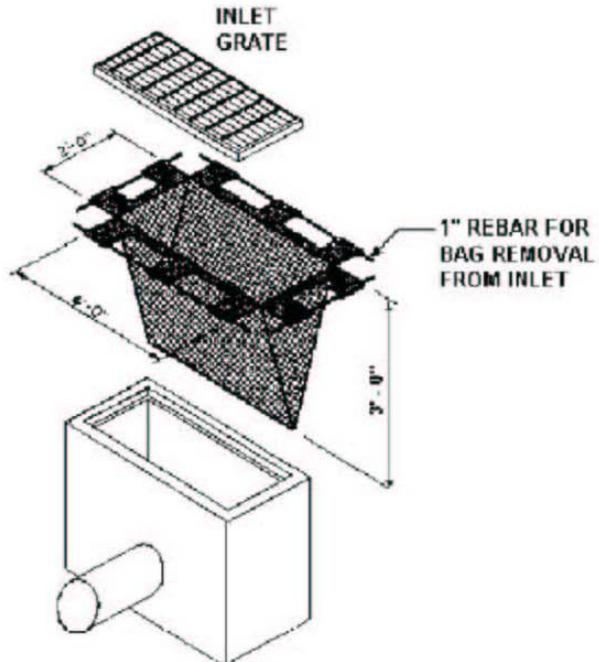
A - FILTER BAG INLET PROTECTION CURBED ROADWAY
